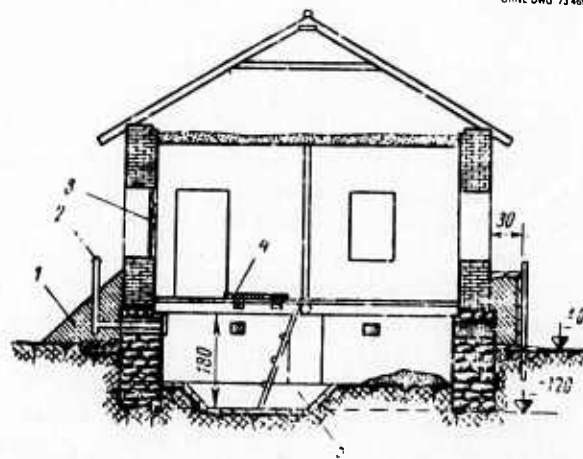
Basement of a stone house adapted for shelter: (1) earth embankment; (2) exhaust duct; (3) curtains on windows; (4) airtight hatch; (5) recessed pit. Material requirements: lumber, 0.5 m³; nails, 1 kg; earth, 3-5 m³; labor, 15-29 hr [man-hours].
